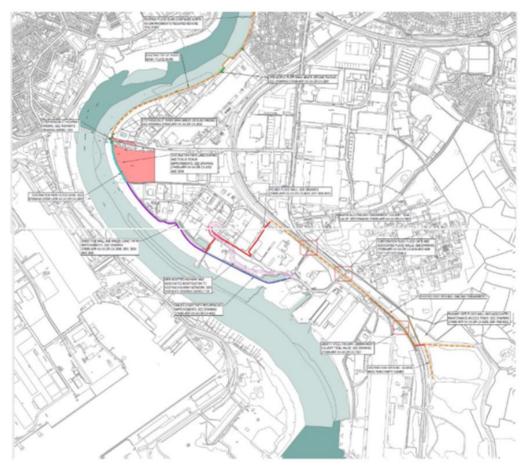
Extract of Site Overview Plan illustrating the linear nature of the scheme along the Eastern bank of the River Usk, flood relief road and railway embankment works.
